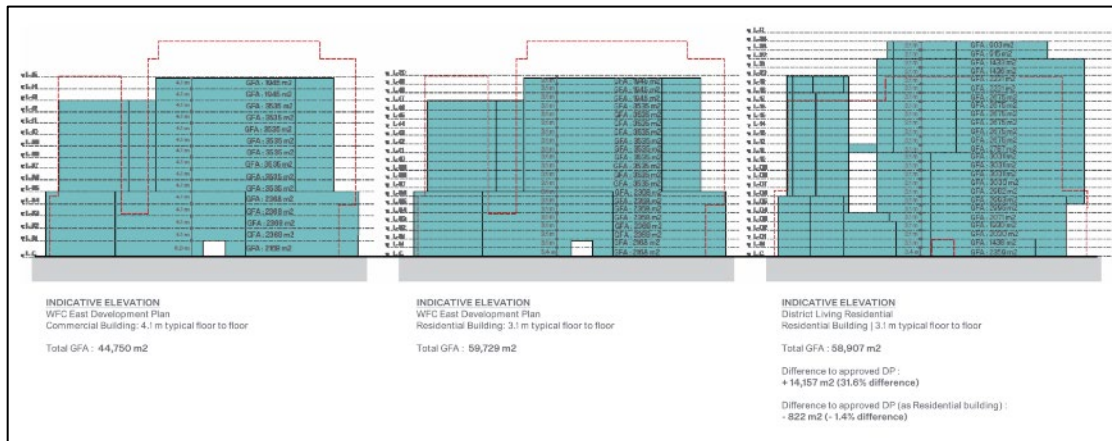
Gross floor area analysis of Building 02 (source: Urban Context Report)
